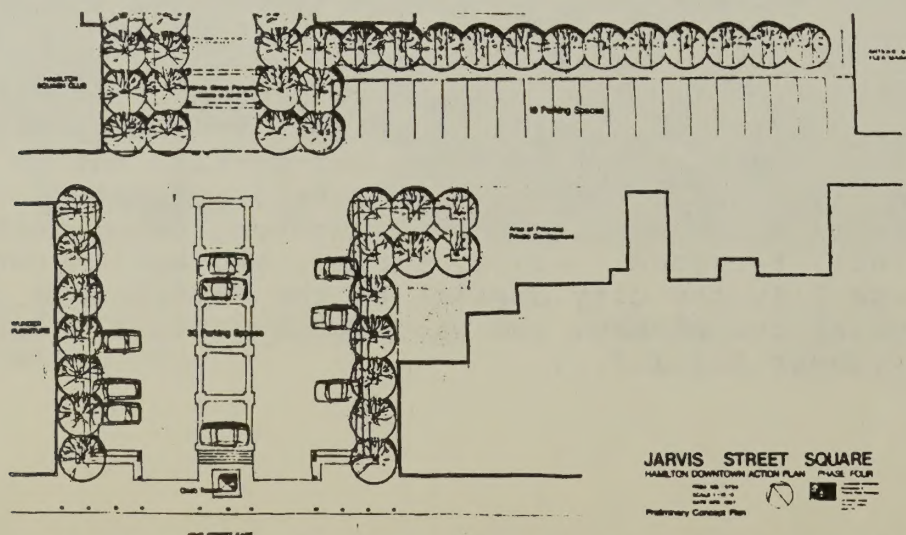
Concept Plan for the Jarvis Street Parking Lot (Moorhead Fleming Corban McCarthy)
